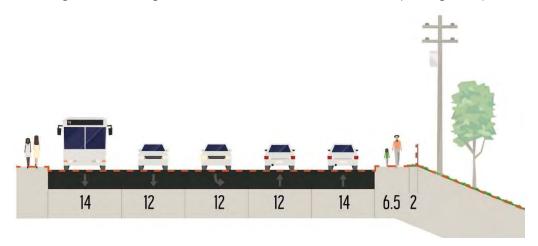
Existing 12th Street cross section south of Nix Dr (looking north)
